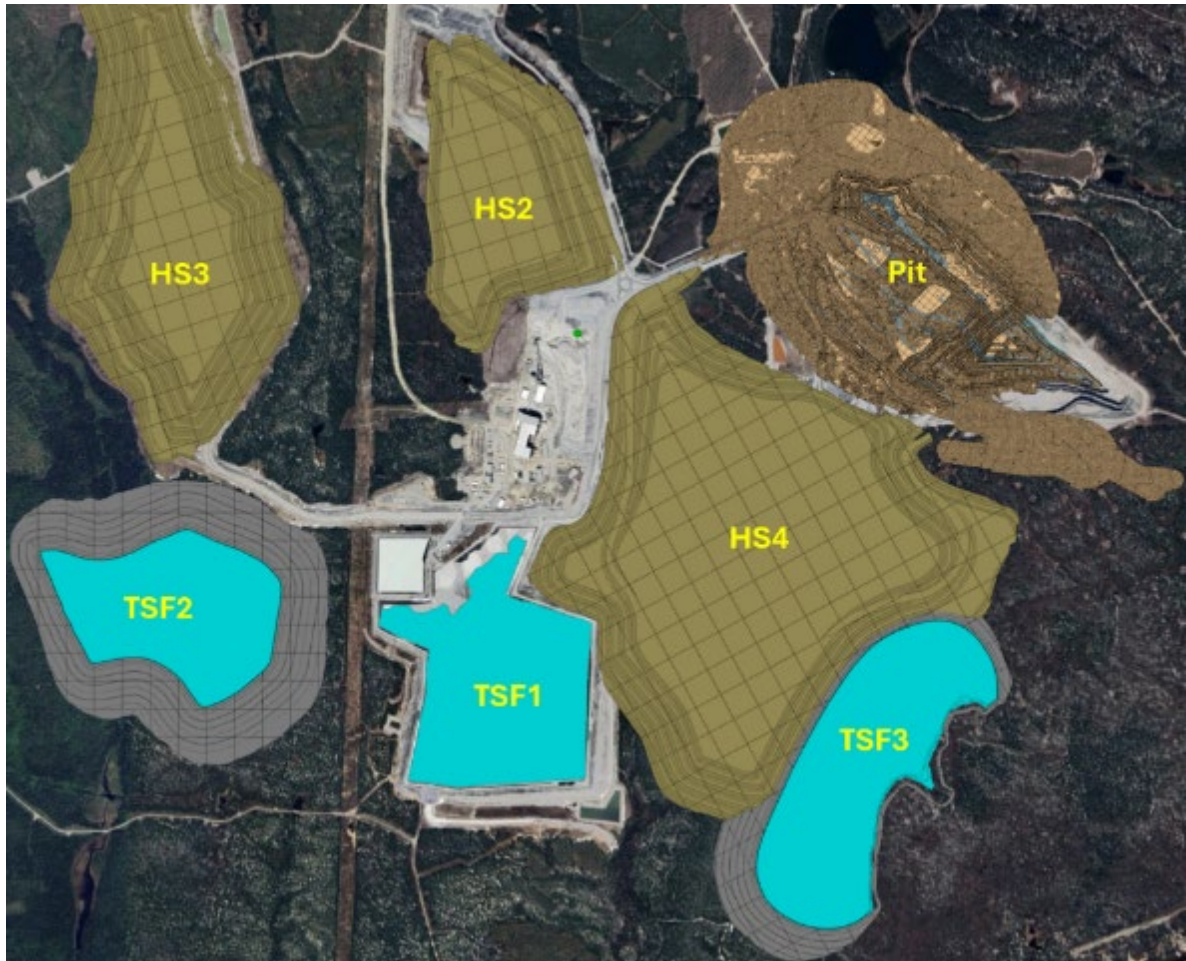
Plan view – Preliminary Mine Waste Storage Facilities Locations
